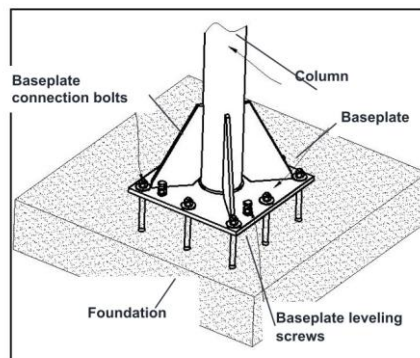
Column-Mounted Foundation Installation (reference only; project foundation drawing governs)
